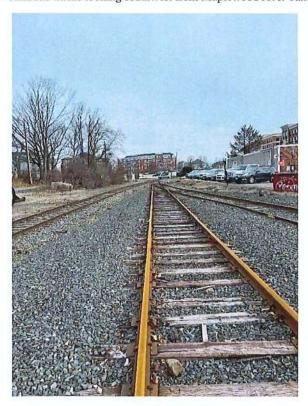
Railroad tracks looking northwest. Taken 1/19/23
